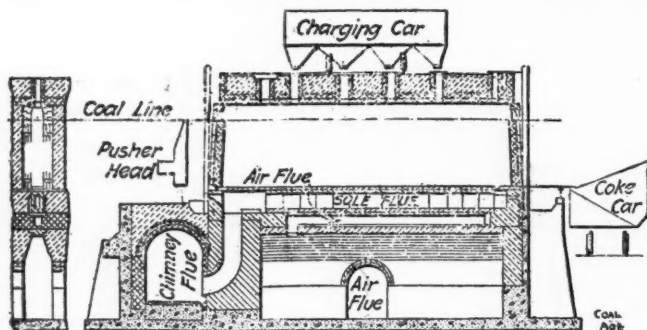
LONGITUDINAL AND END ELEVATIONS IN SECTION
